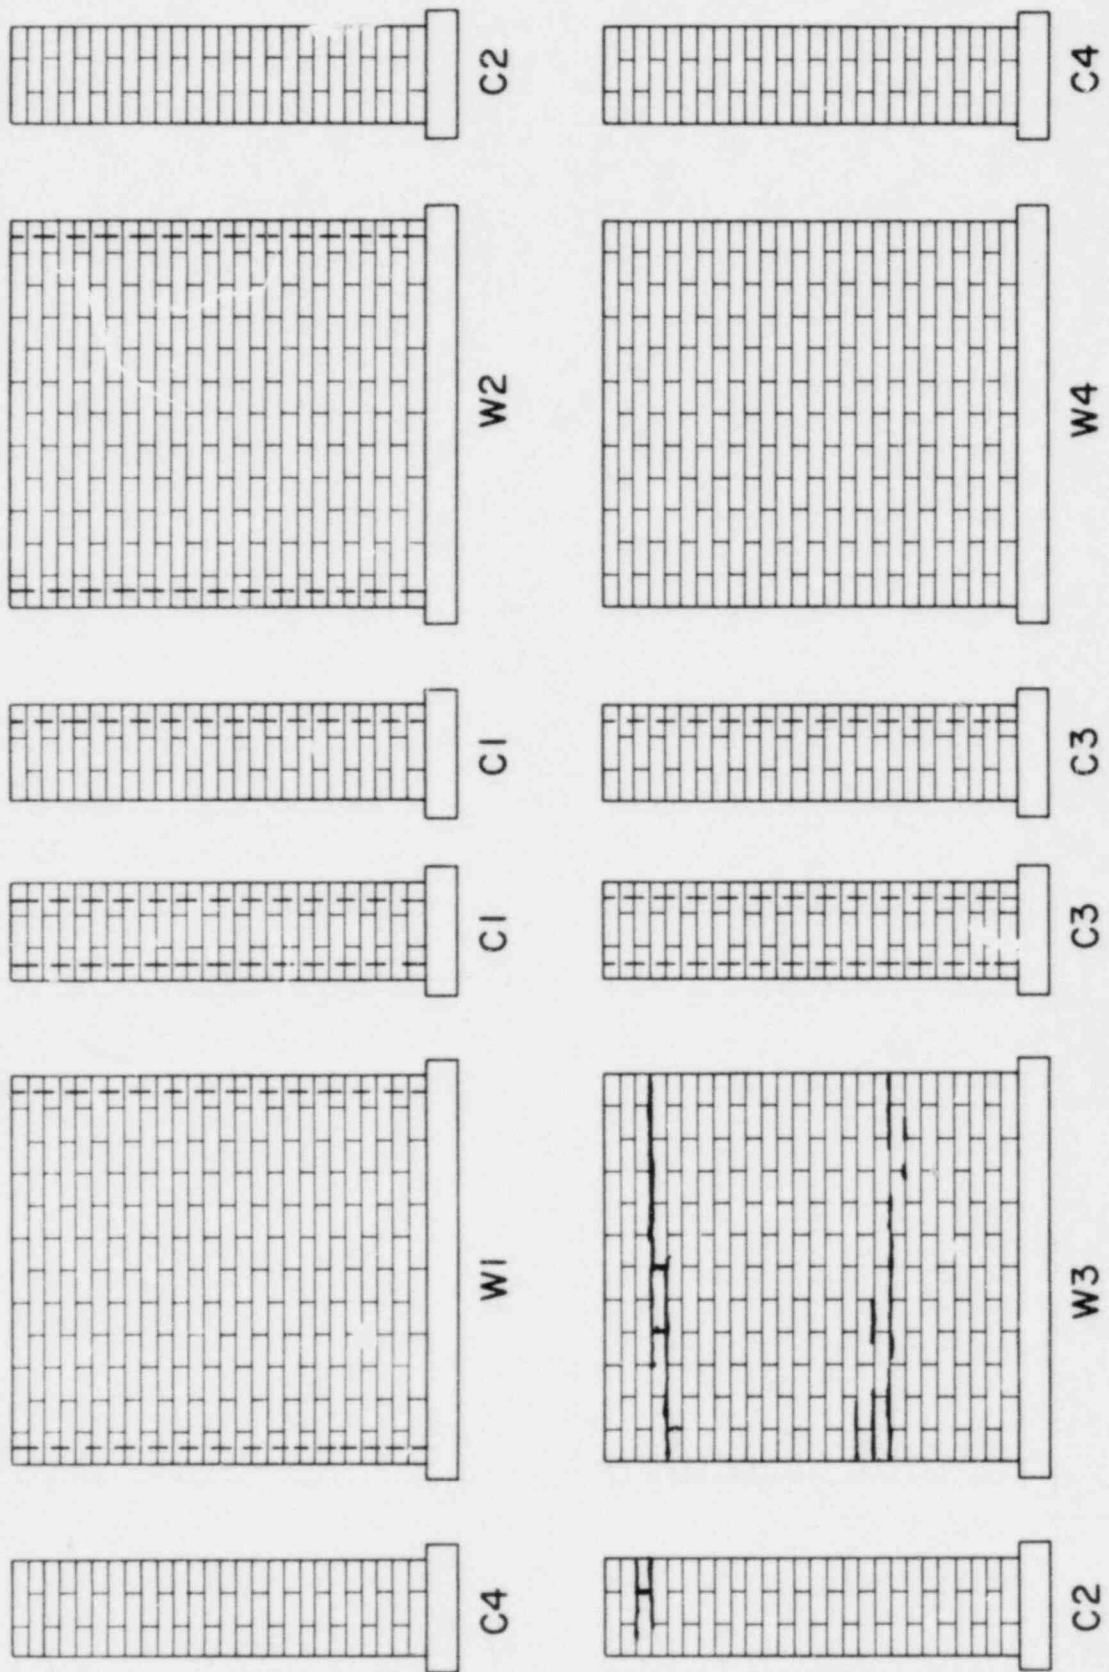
(b) DISTRIBUTION OF CRACKS IN THE MASONRY COMPONENTS: HOUSE 1, AFTER ROOF STRUCTURE WAS INSTALLED
